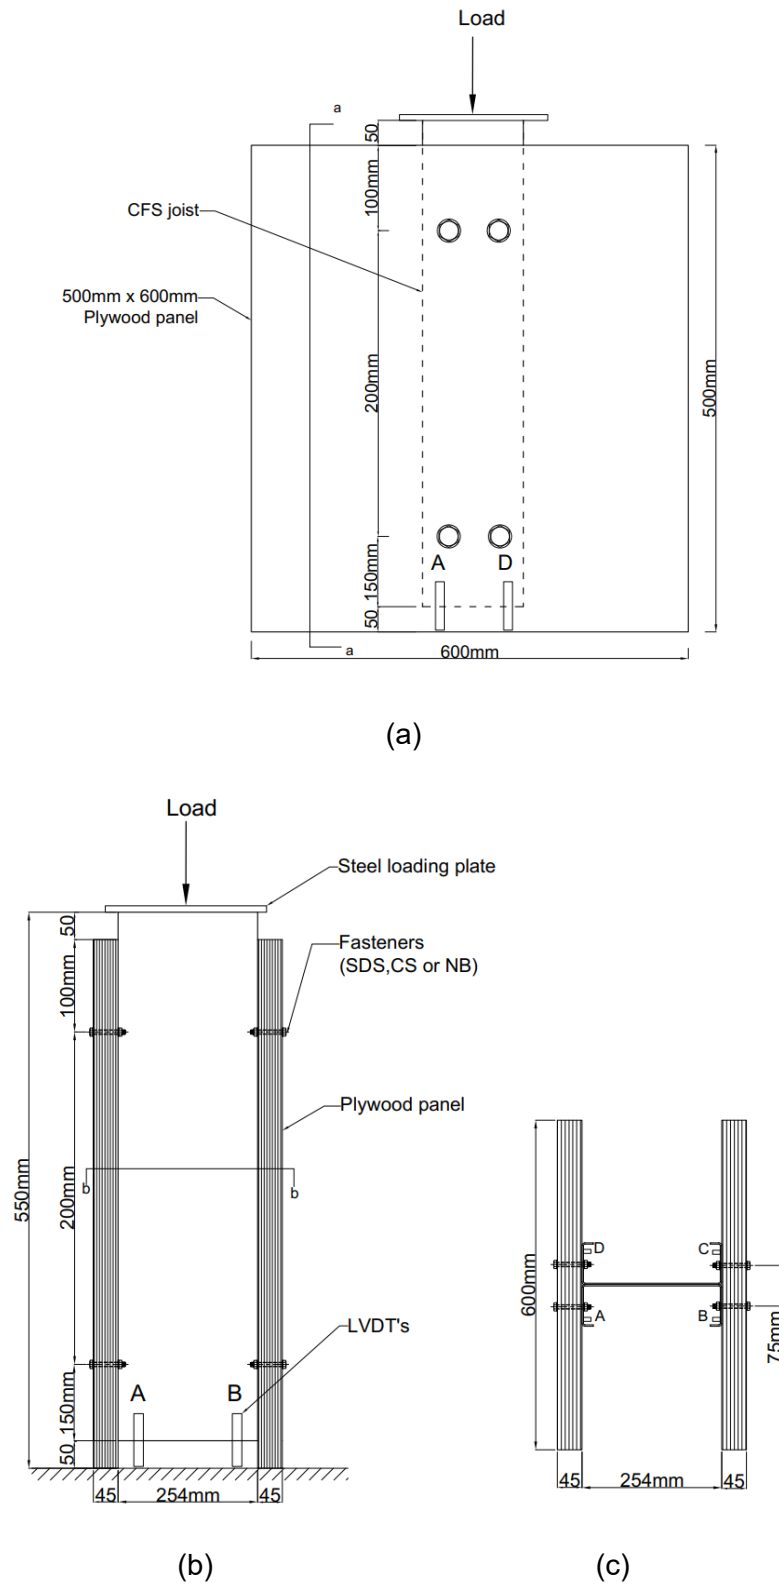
Push-out specimen schematic view: (a) Elevation view; (b) Section view a-a ; (c) Plan view b-b
